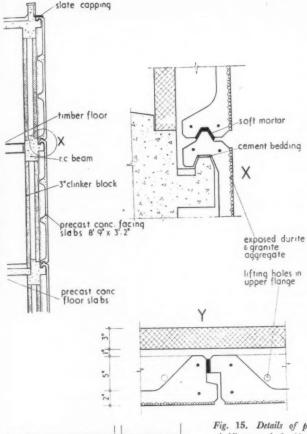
Details of precast cladding on end of gable walls of 11-storey blocks.
